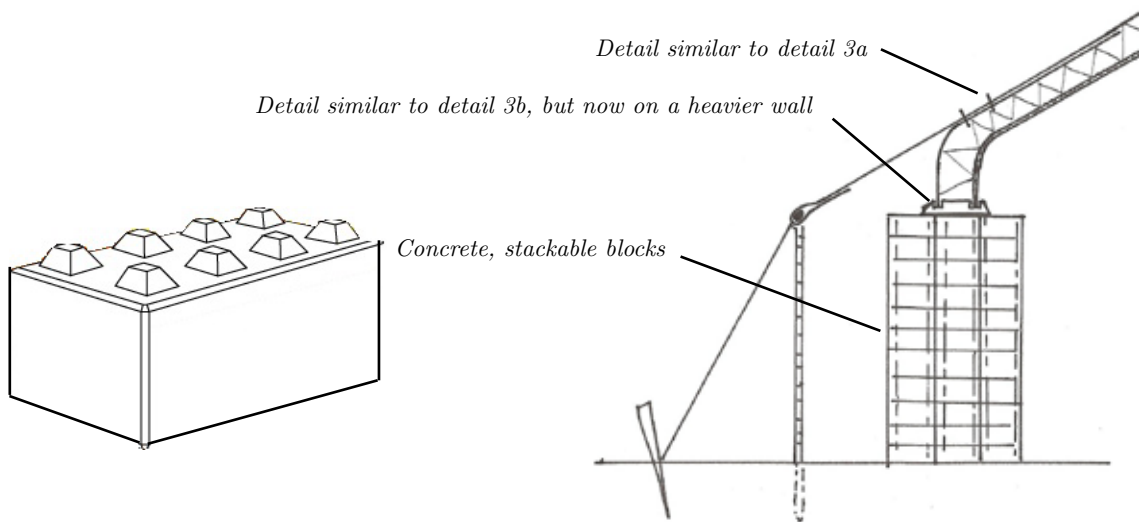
Three details for a hybrid solution. 8) the heavy wall, 9) connection between membrane and heavy wall, 10) connection between 'wide' membrane and heavy wall.
